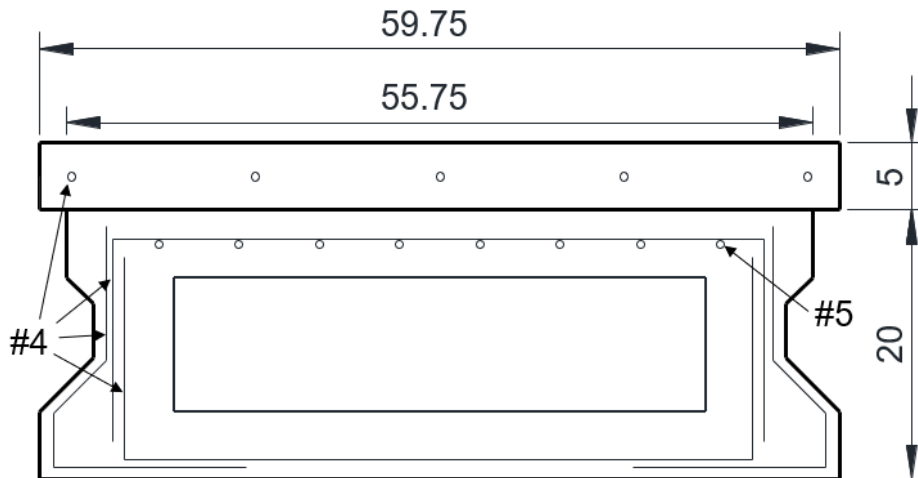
The cross-section geometry and reinforcement detail for 5B20 and 5-in. height deck
